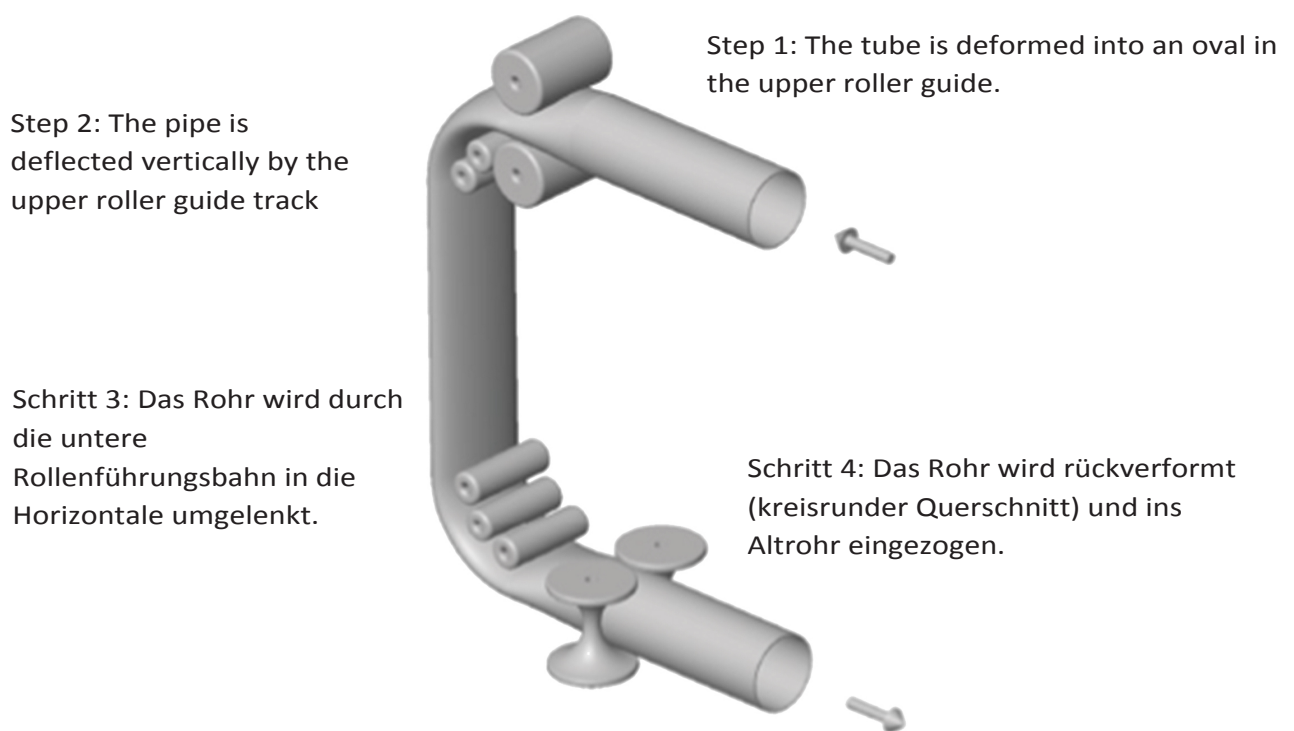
Forming technique for deflection of the pipe when moving into the excavation/manhole
